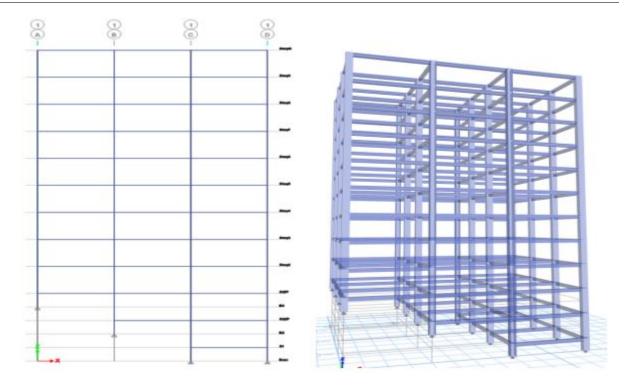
Front elevation and 3D view of 27⁰ model with flexible base
